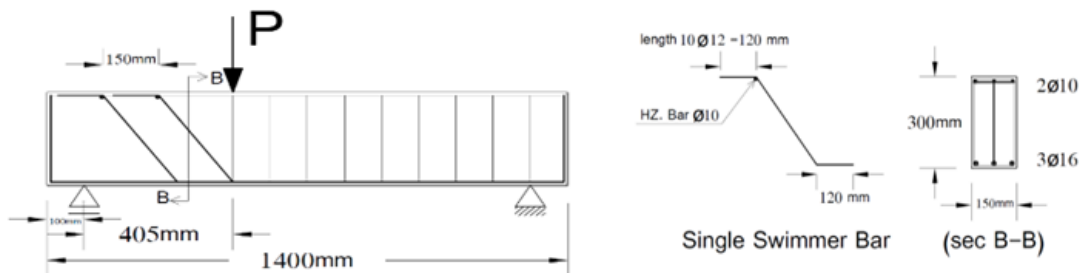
Longitudinal and cross Sec in beam with two single swimmer bars in the cross-section.
